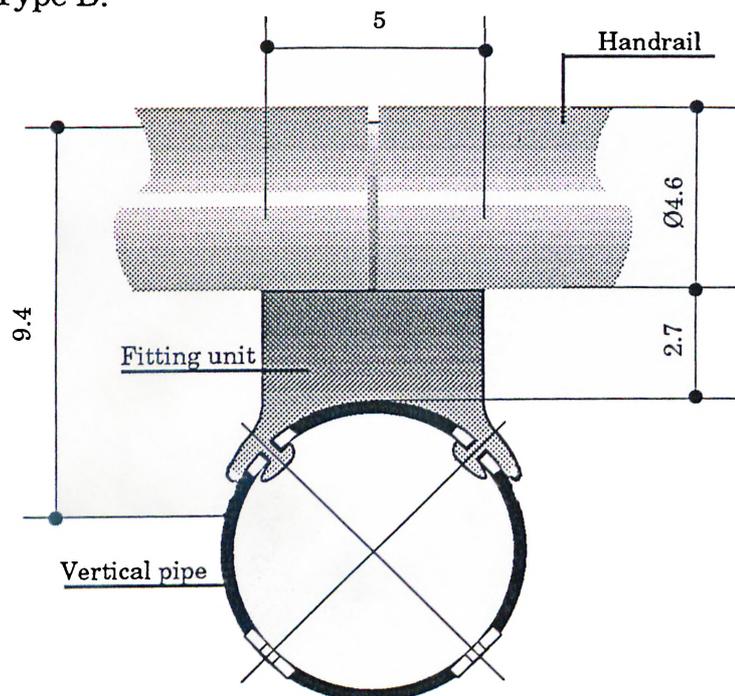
The Sectional Detail of Assembling the Handrails with Pipes.
